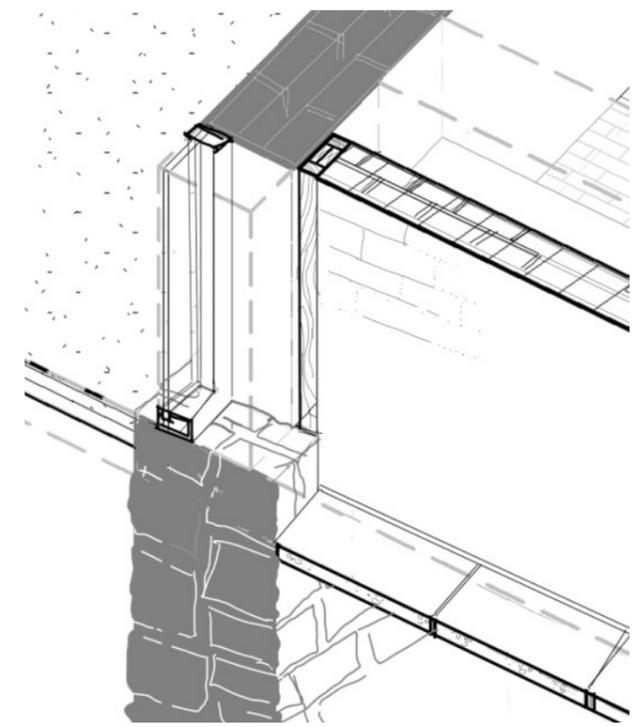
Revit sketches: detail that shows charred timber separation between old masonry and new masonry walls at bathrooms (Author 2013)
